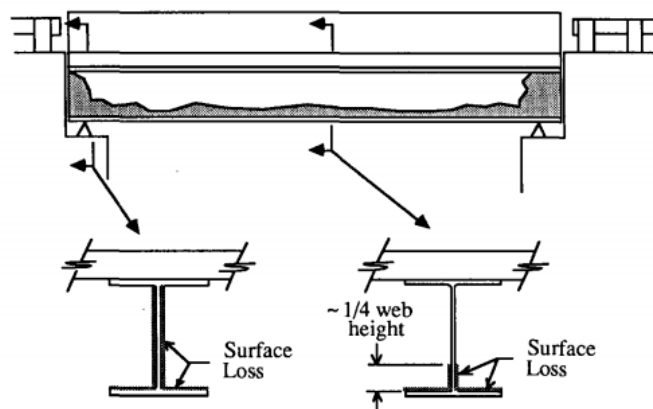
Typical location of corrosion on a steel girder bridge
